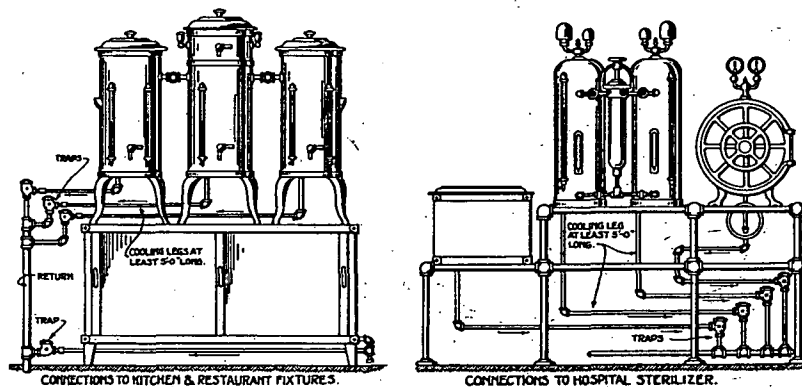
TYPICAL CONNECTIONS TO KITCHEN AND HOSPITAL EQUIPMENT
